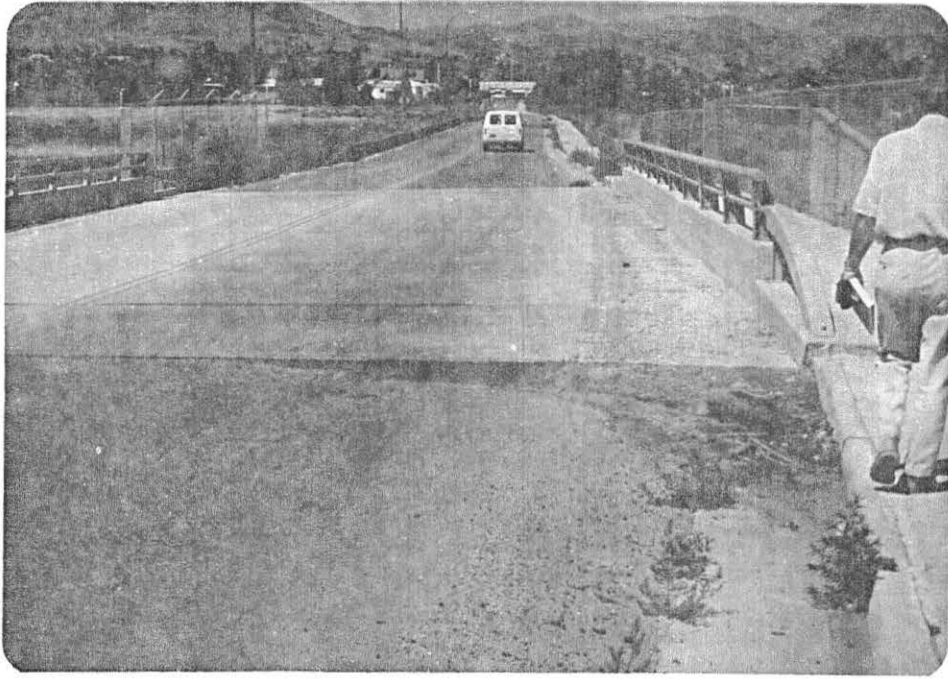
Crest of Maple Grove Dam, looking west.
